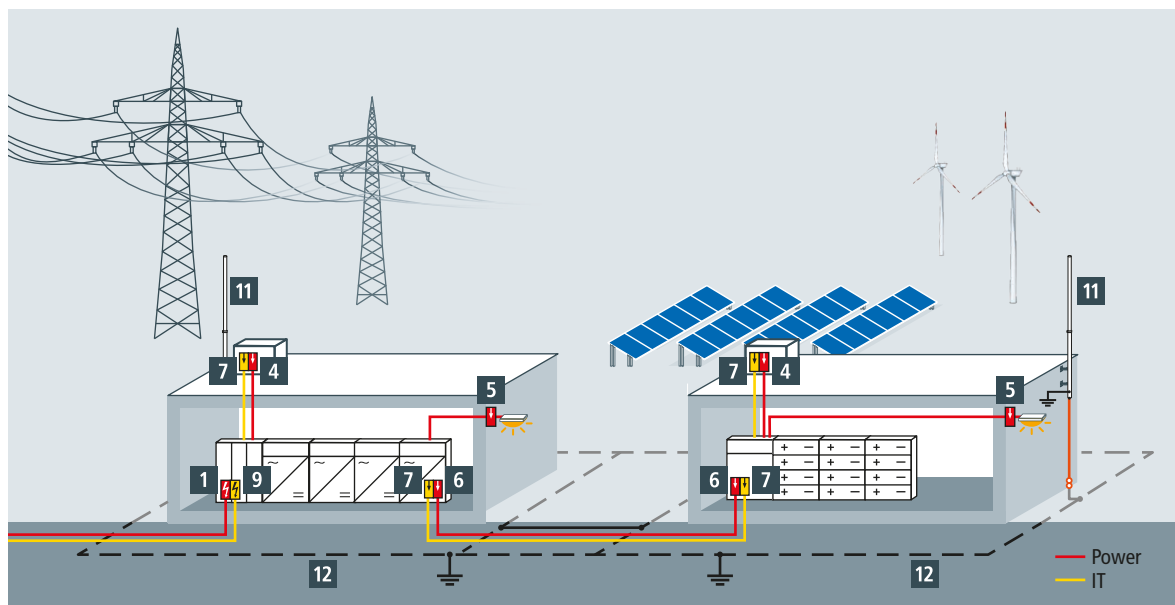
Battery storage system for power grid as a concrete construction with HVI Lightning protection
